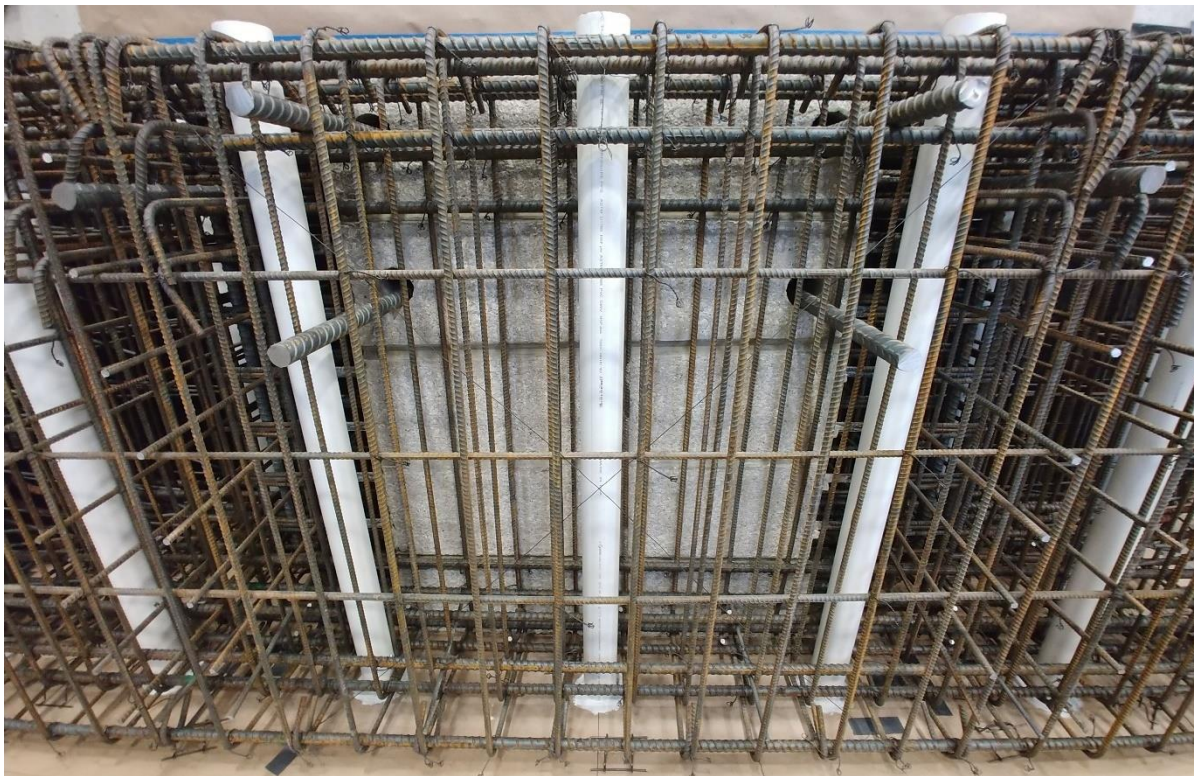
Connectivity Reinforcement Passing Through Support Stub in Foundation of Test Walls.
